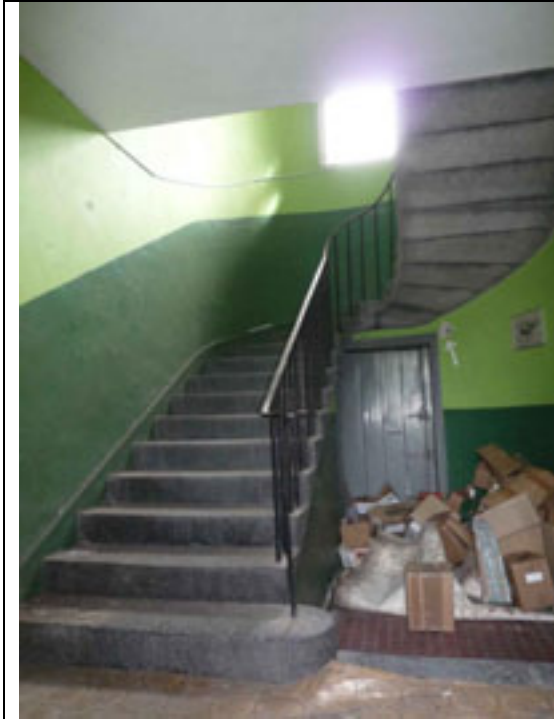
Cantilevered staircase rising from ground to first floor. Note the apsidal end to this room.
